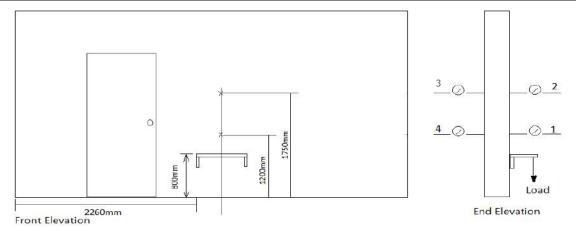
Location of applied load for heavyweight anchorage wash basin eccentric downward loading test
